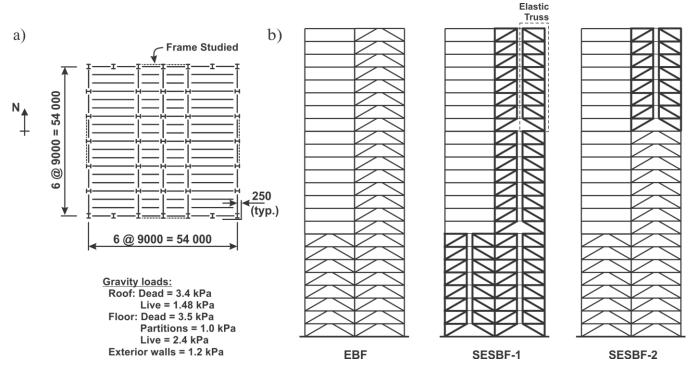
Floor plane view and elevation view of the lateral force resisting system: a) floor plane view and loading condition; b) structural configurations studied.
